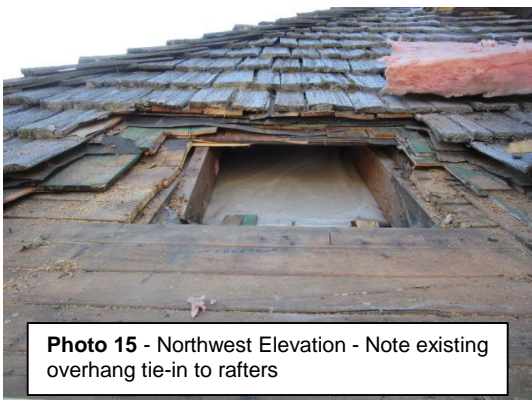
Northwest Elevation - Note existing overhang tie-in to rafters
